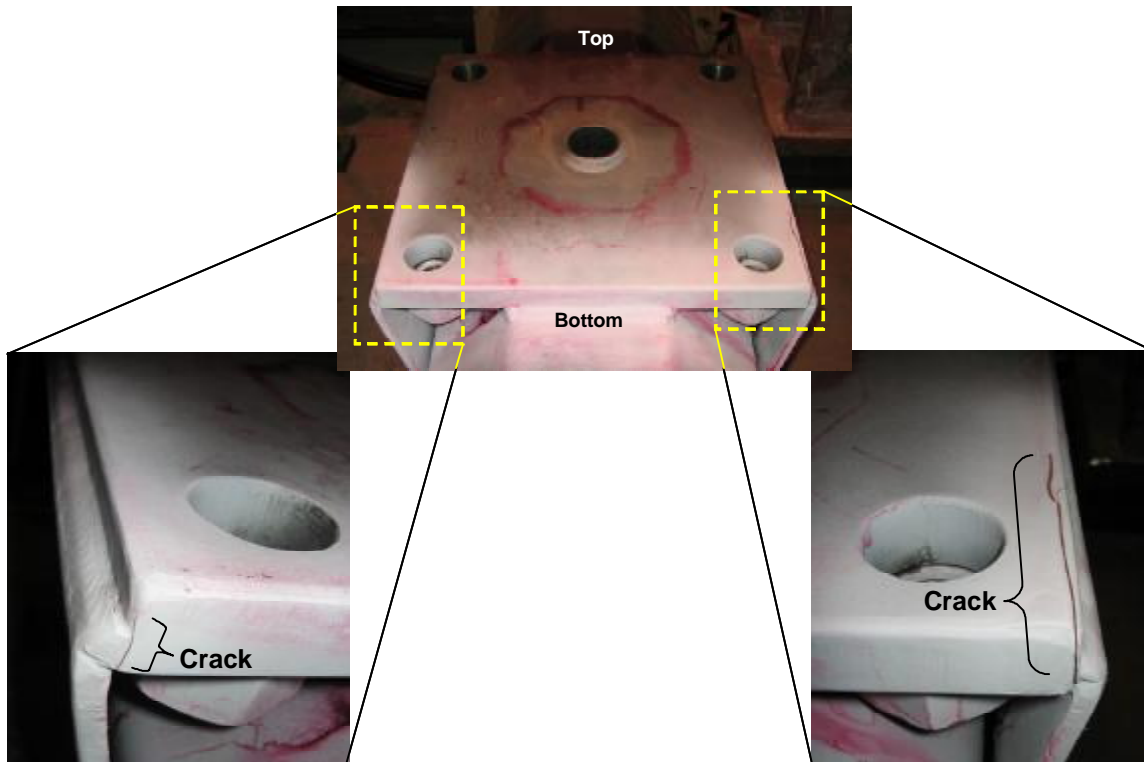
Type I box connection cracking from in-plane loading (T1P2)
